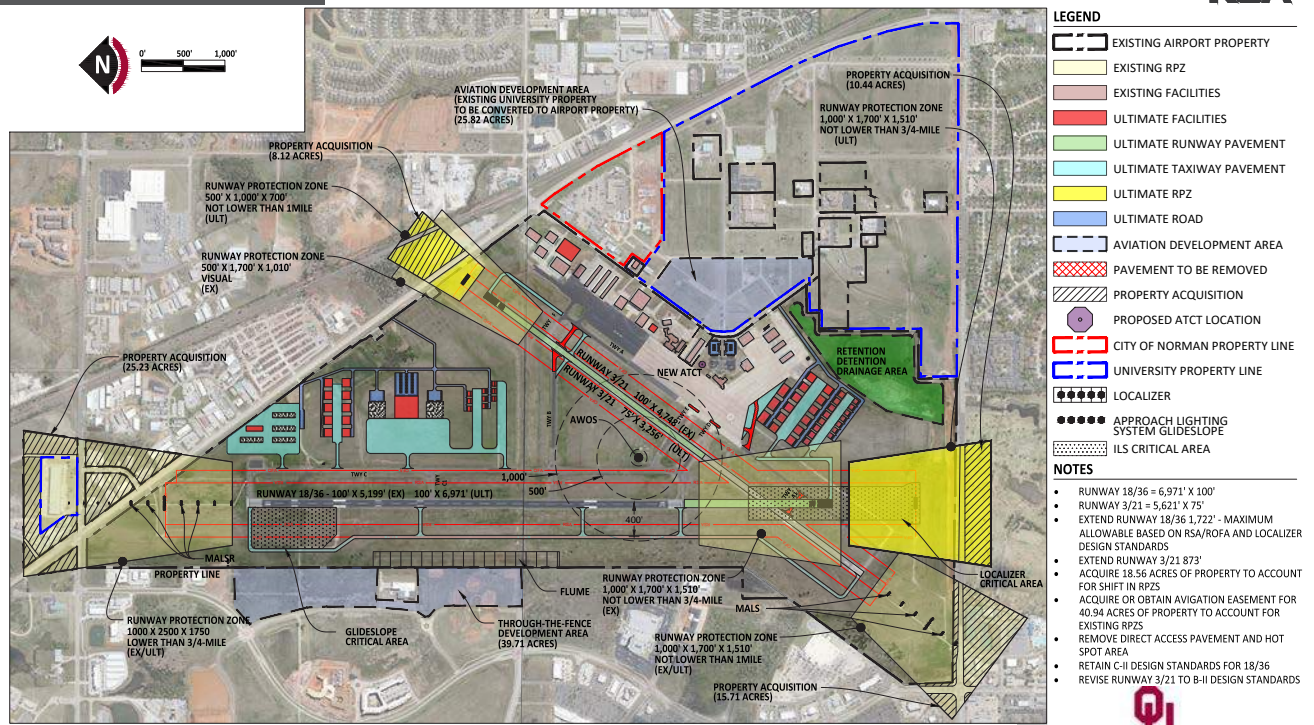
RECOMMENDED DEVELOPMENT PLAN
